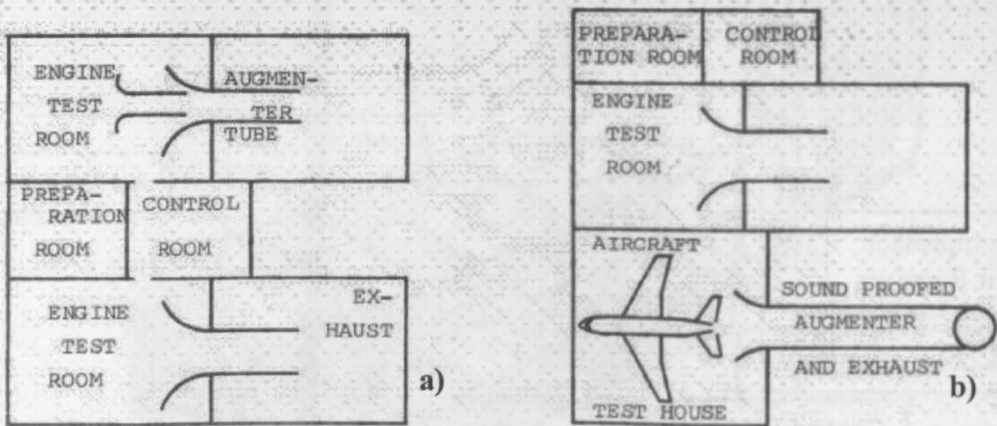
General Lay-Out for Indoor Test Facilities (Jaques 1984)
